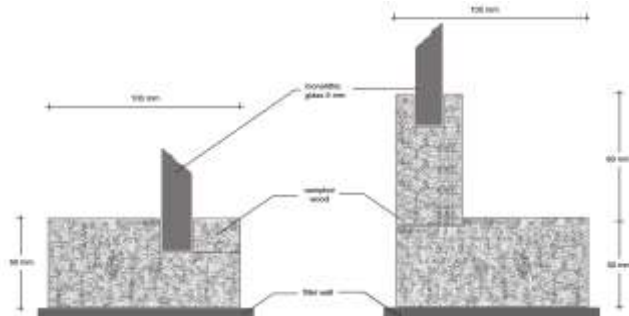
Detailed section of the timber frame of fixed (left) and open (right).
